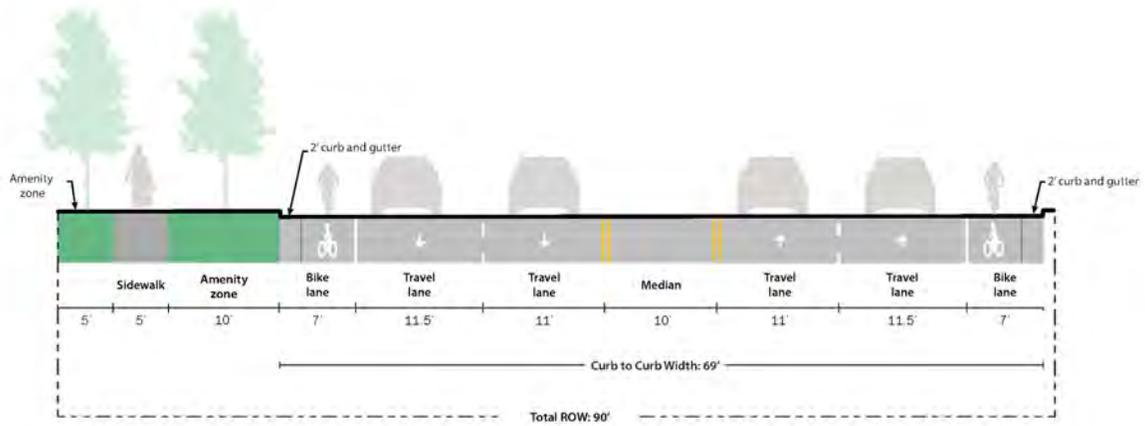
Section C (72nd Avenue East of Depew Street – Looking East)
